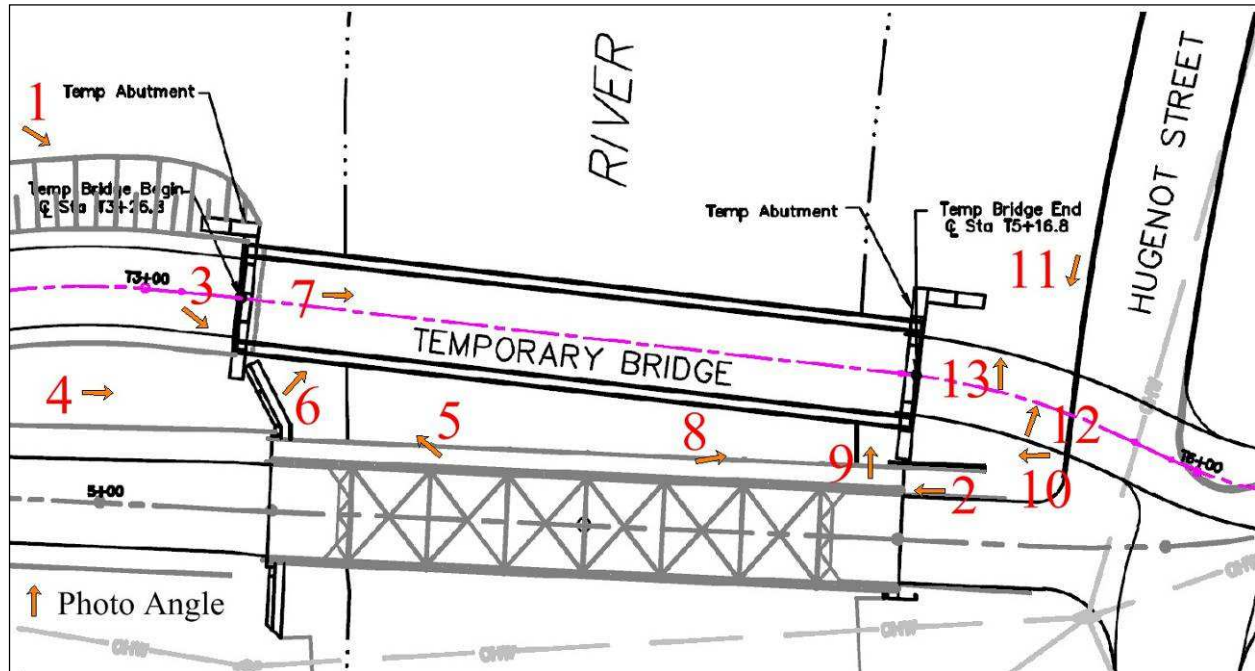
PHOTOGRAPH LOCATIONS SHOWN ON PROPOSED SITE PLANS.
